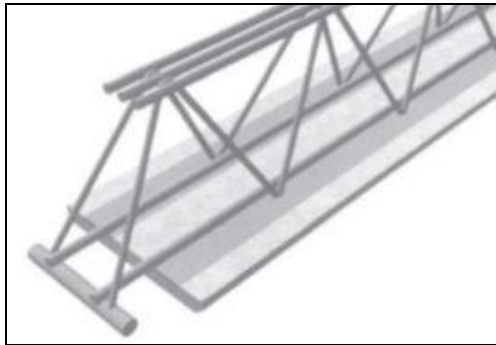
Hybrid Steel Trussed Concrete Beam Topology [5]
